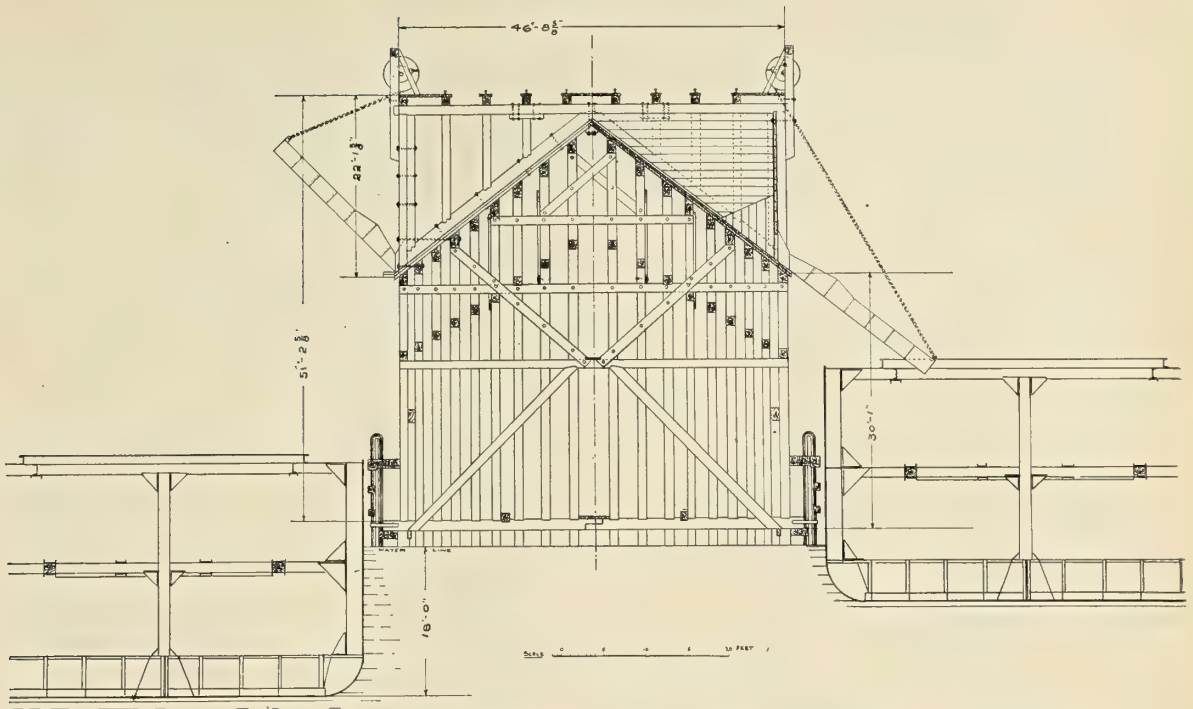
CROSS SECTION OF TYPICAL ORE-LOADING DOCK.
